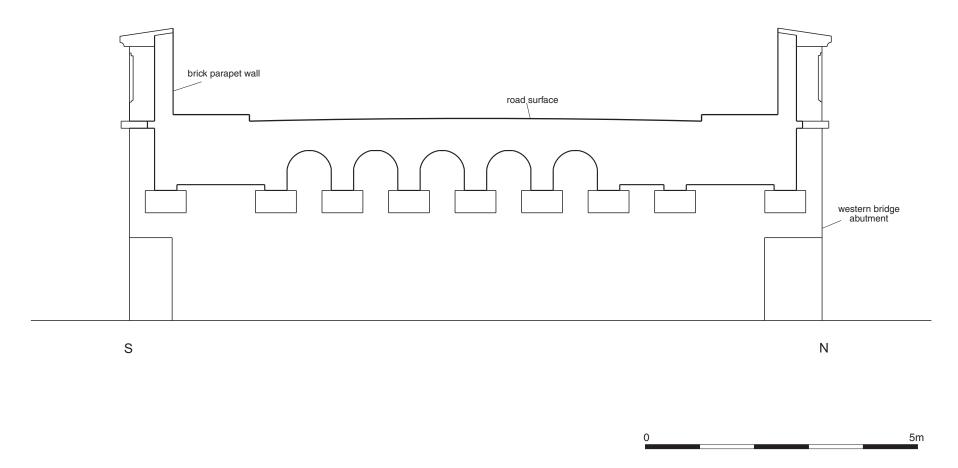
East-facing sectional elevation through Eastway Road Bridge
